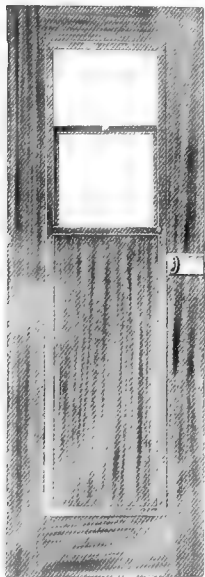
End Steel Door, Showing Drop Sash and Lower Half of Door of Panel Construction.
